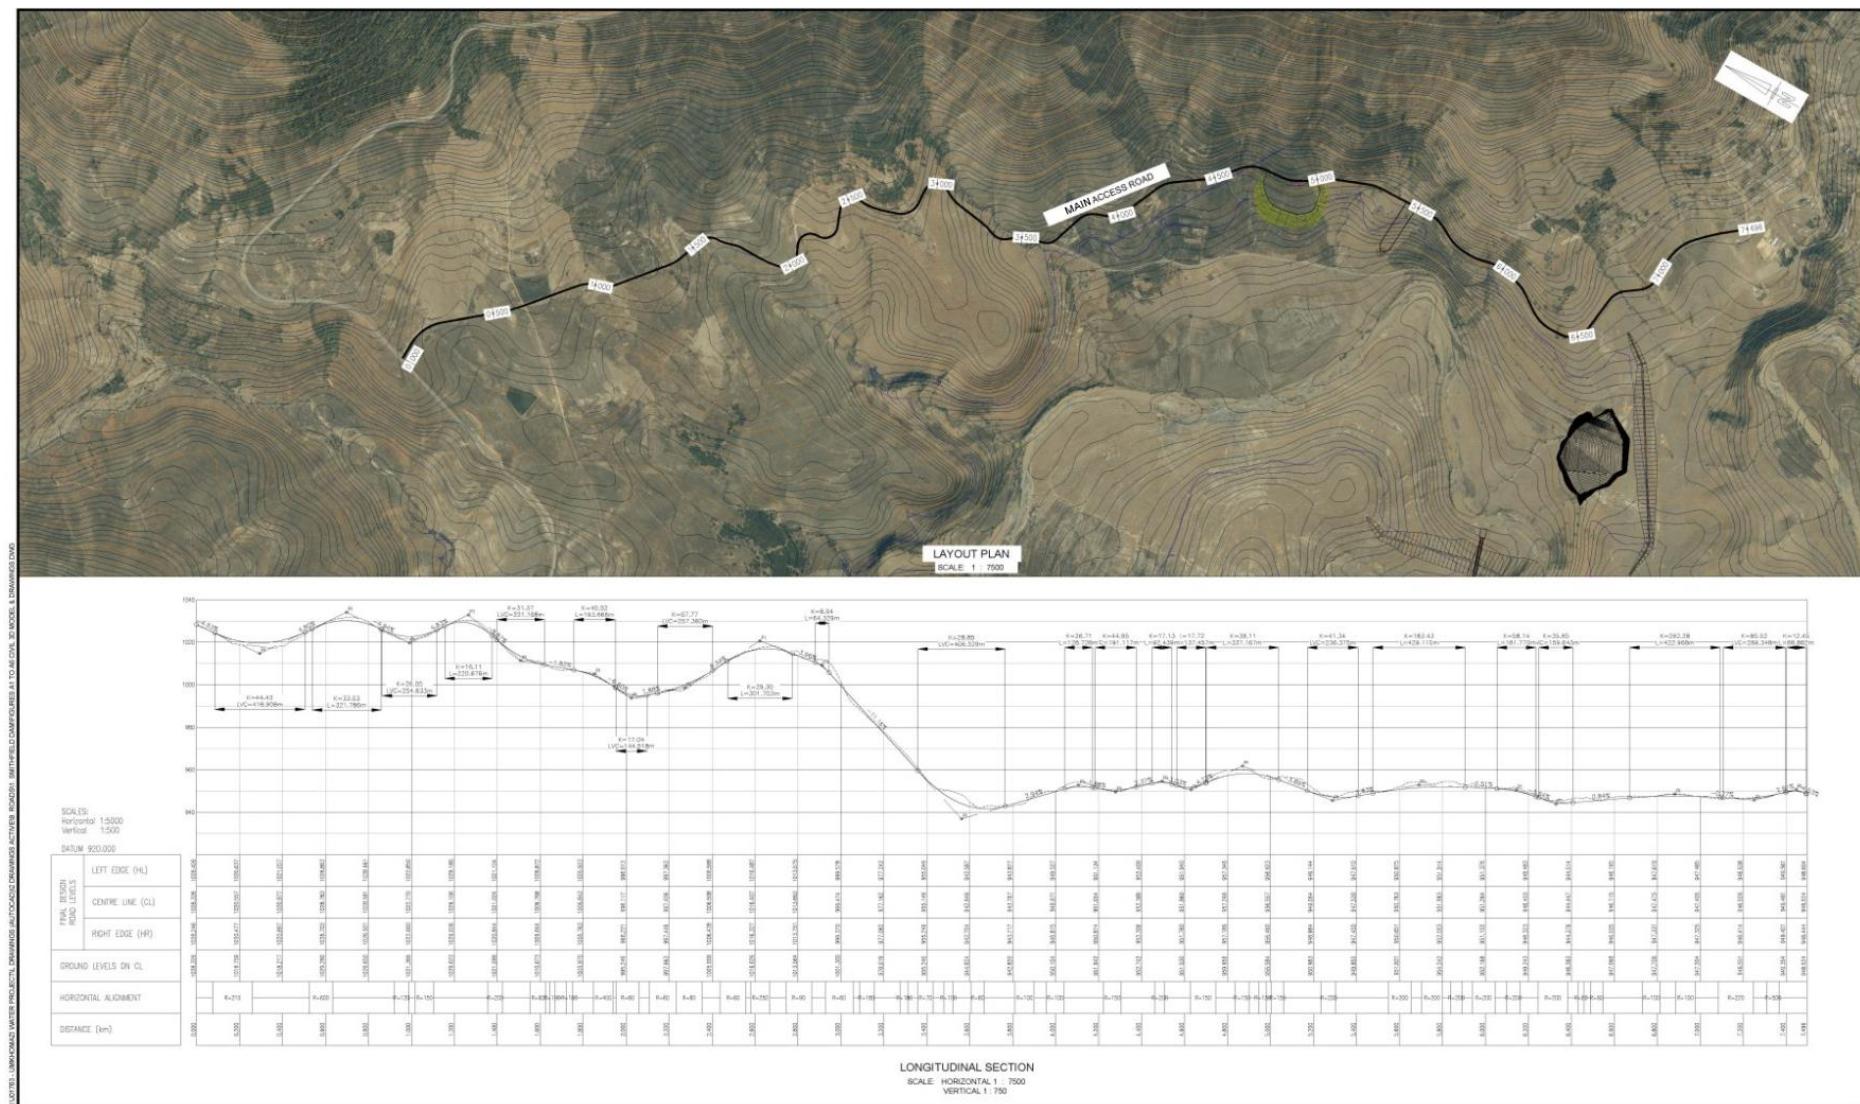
C.4: Smithfield Dam – Layout plan and longitudinal section of main access road
